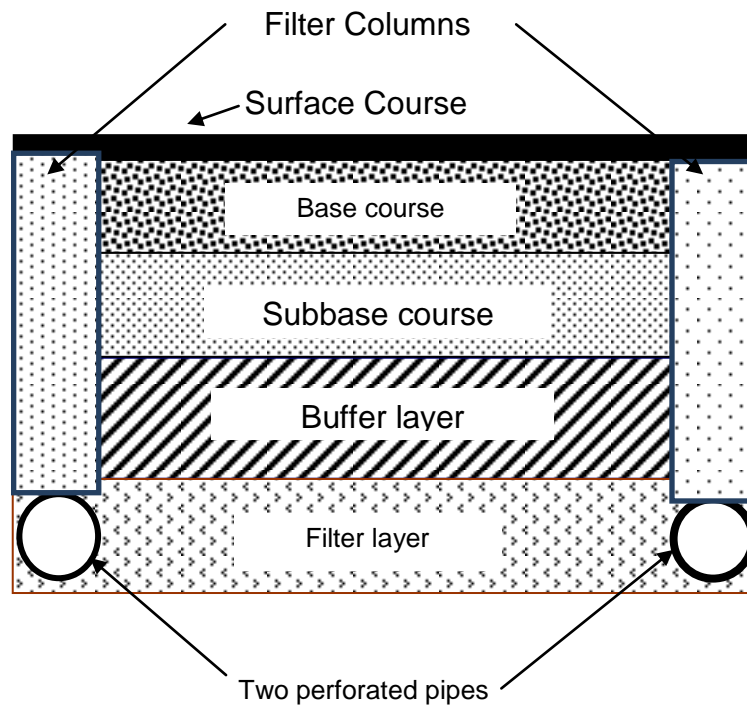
Recommended Pavement Structure for Roads on Expansive Clay Soils
